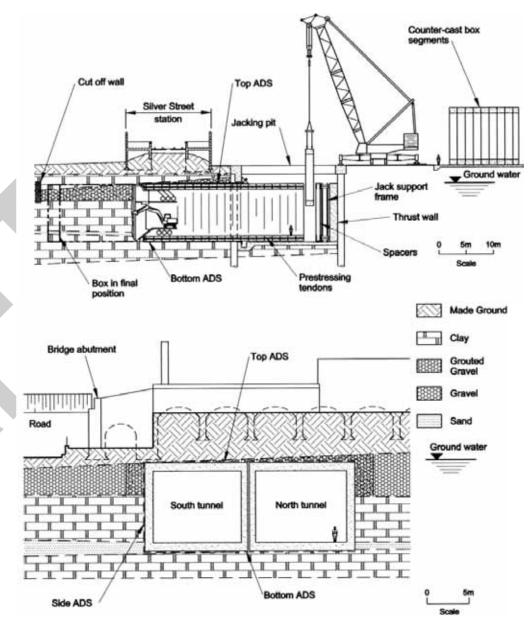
Jacked Box Construction – Silver Street Station in London (AllenBy, 2006)
